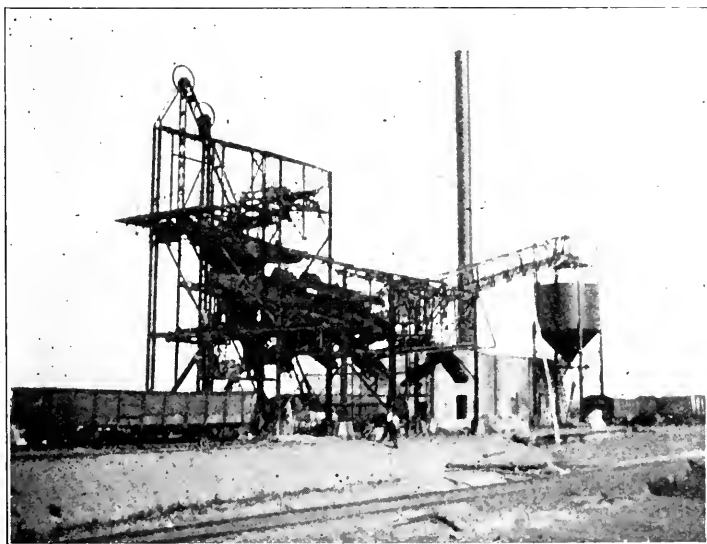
Electric and Steam Plant at Dallas, Ia. (During Construction).
